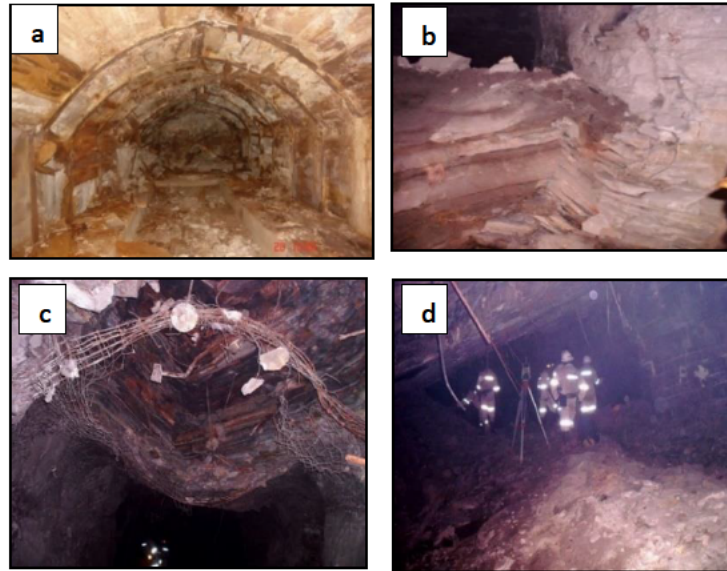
Long-term deformation associated with squeezing (a) Collapsed tunnel, (b) side wall buckling, (c) roof sagging and (d) floor heave (Photos taken by the author).
